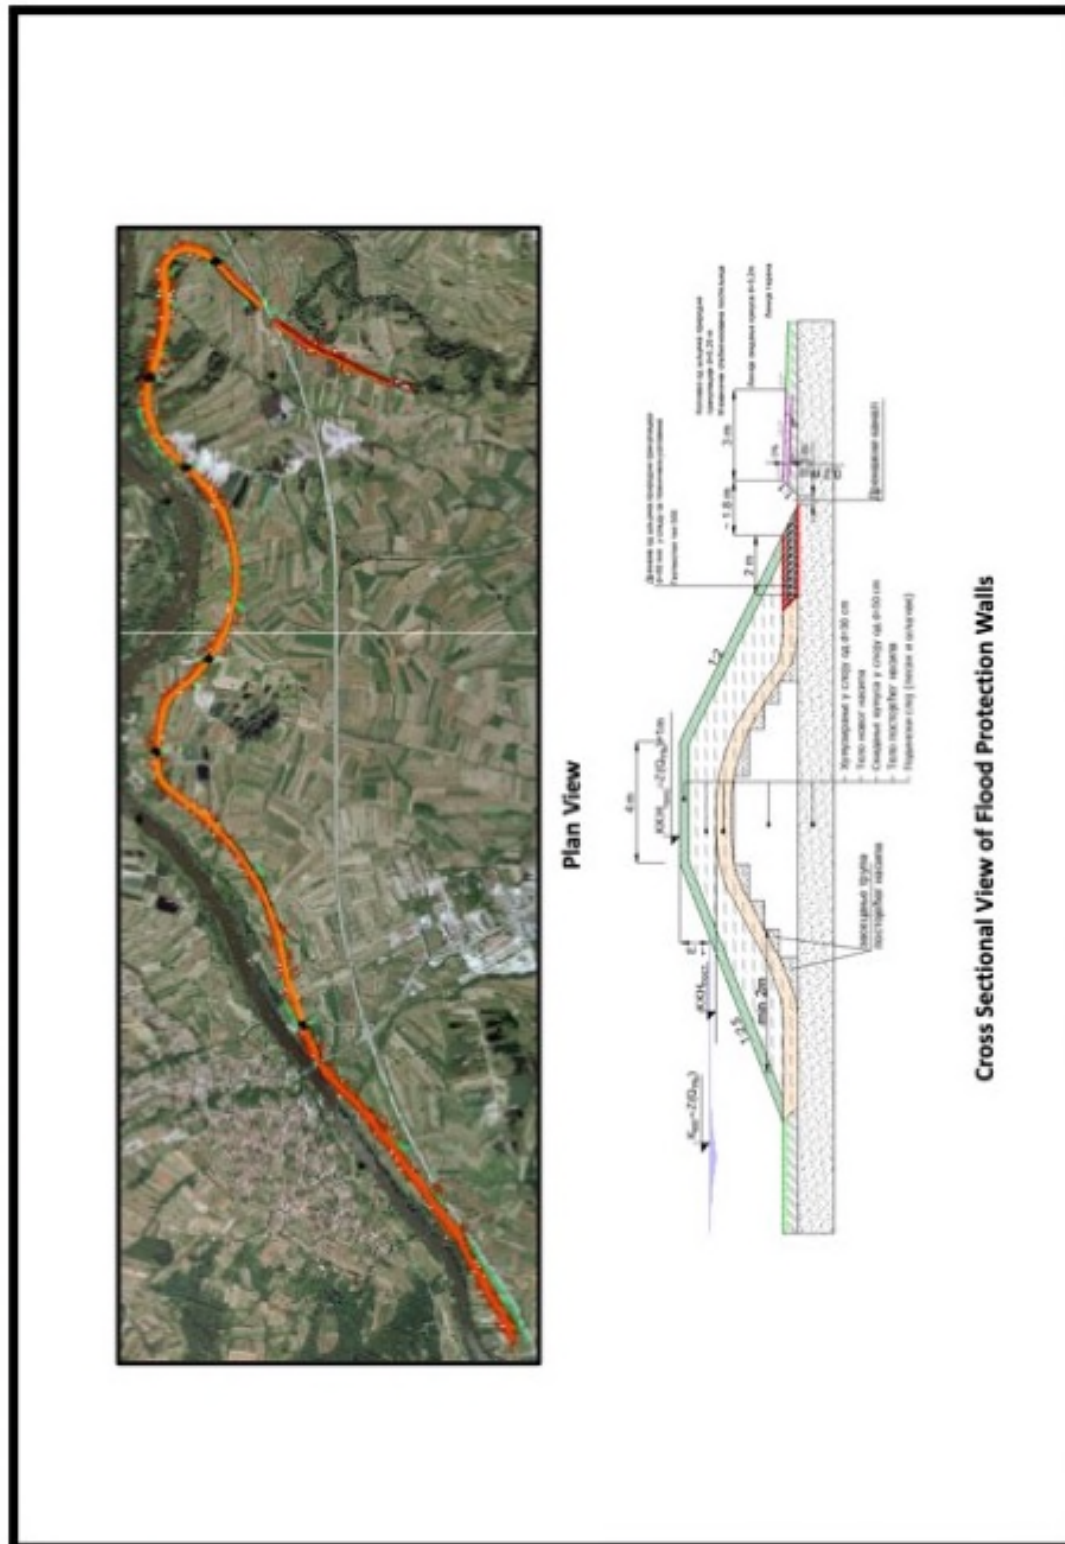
The route and typical cross-section of the Structure 3, Section-1
